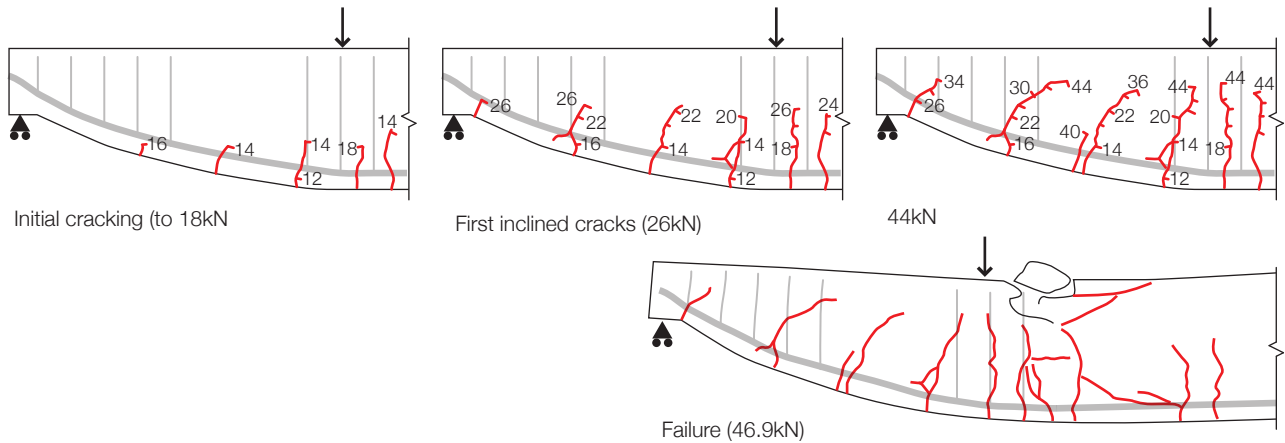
Cracking and failure in Beam 9\_2\_CFP\_V(ii).
